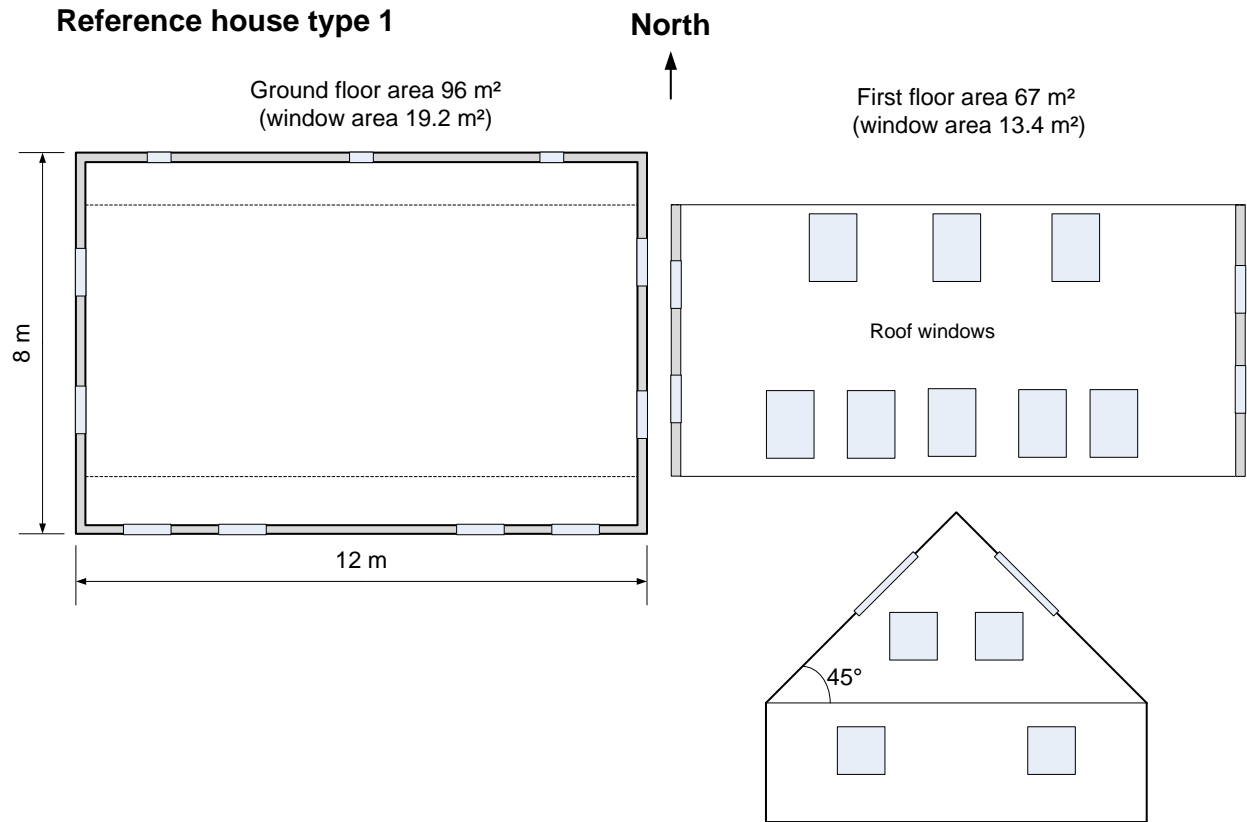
Outline of the reference house type 1 with 45° sloped roof construction
